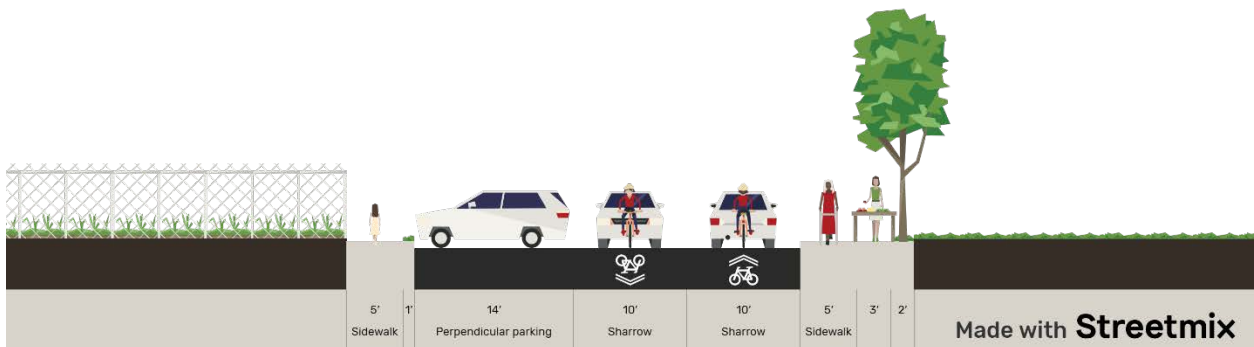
Street cross-section of Alamo Street looking west. On the right side of the street is a park, with two lanes for driving and a small parking area. The proposed street design includes a shared bike lane, marked with sharrows, on the driving lane.
